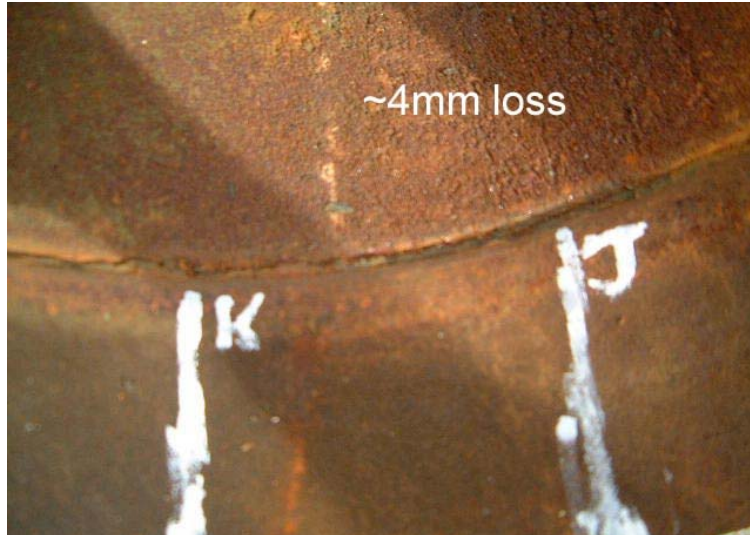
Points J and K where weld has ~4mm maximum loss.
